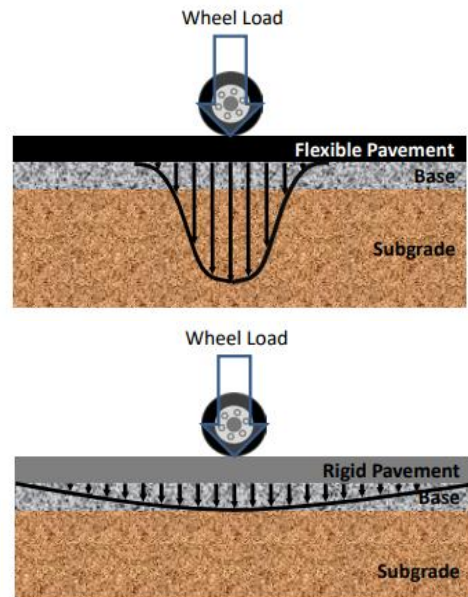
Illustrations. How Rigid Pavements And Flexible Pavements Transfer Applied Loads To The Layers Beneath.
